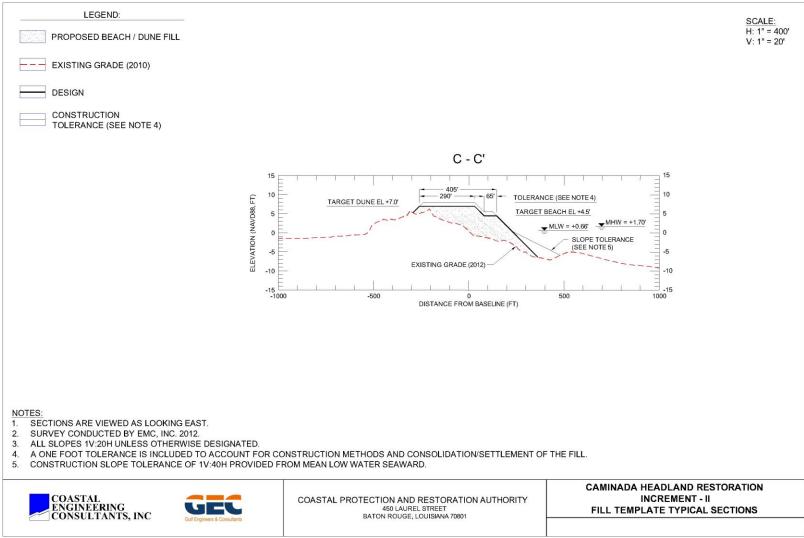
Increment 2 Fill Template Typical Section Beach and Dune Fill
